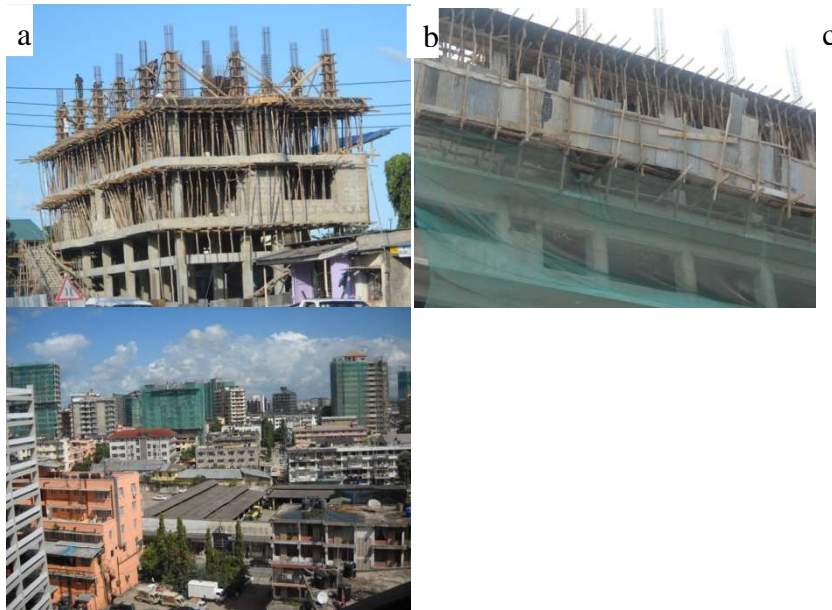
a) & b) buildings under construction; c) many of high rise buildings are under construction
